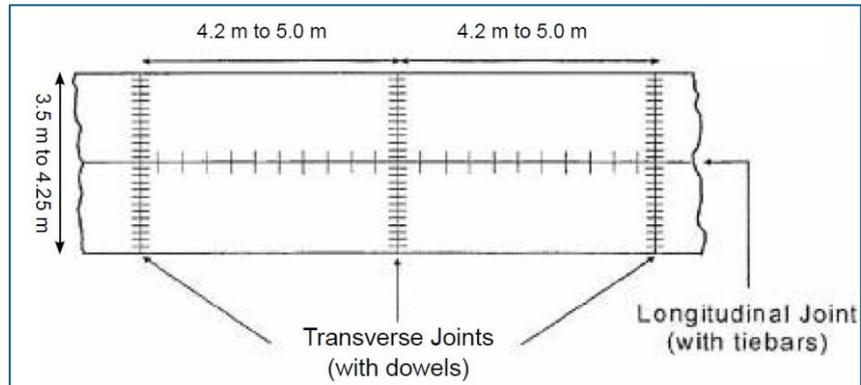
Plan view of Jointed Plain Concrete Pavement (JPCP)
